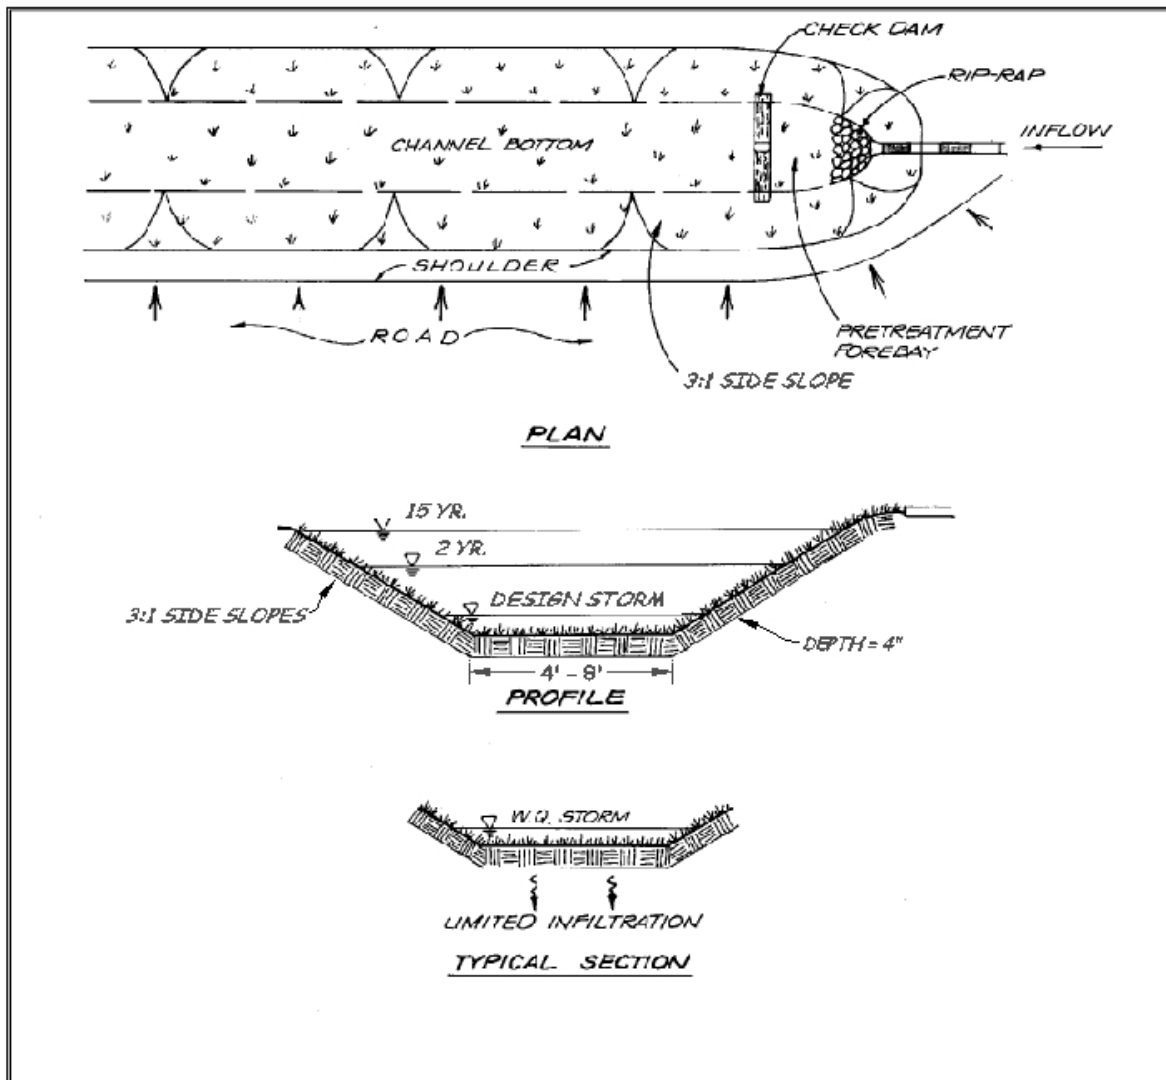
Grass Channel Typical Plan, Profile, and Section (O-1).
